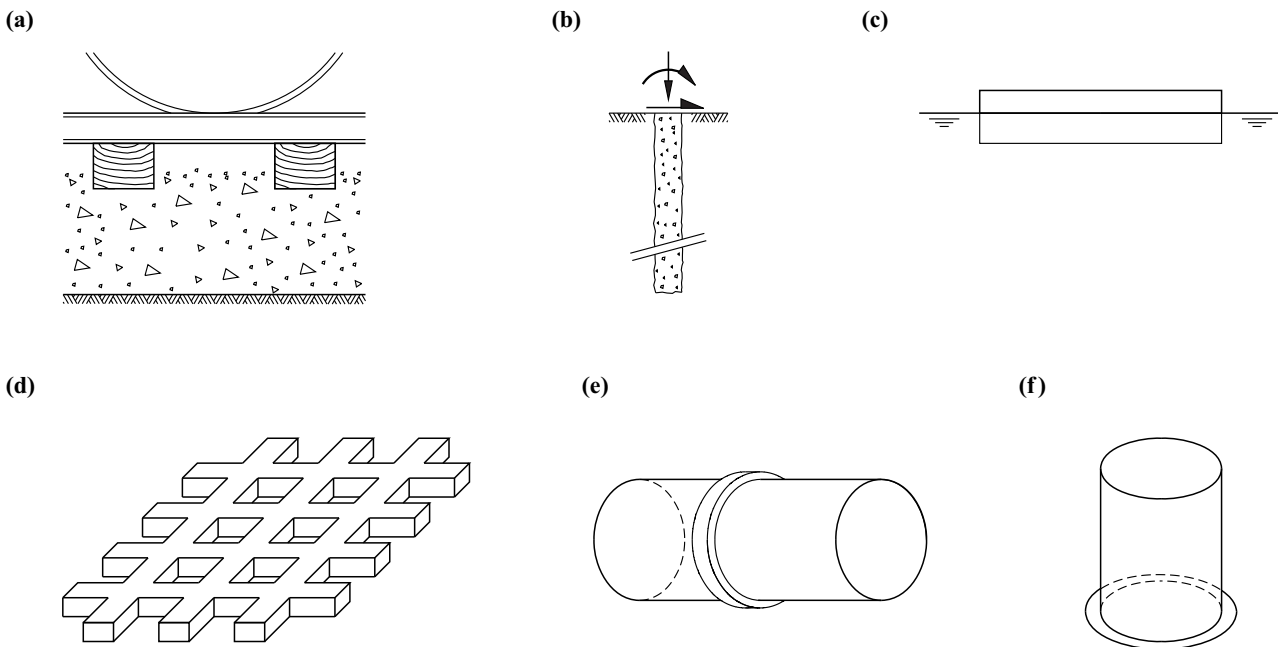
Beams on elastic foundation: (a) railway track, (b) laterally supported piles, (c) pontoons, etc. floating on water, (d) grillages, (e) pressurised pipes with stiffening rings, (f) tanks, silos, etc.
